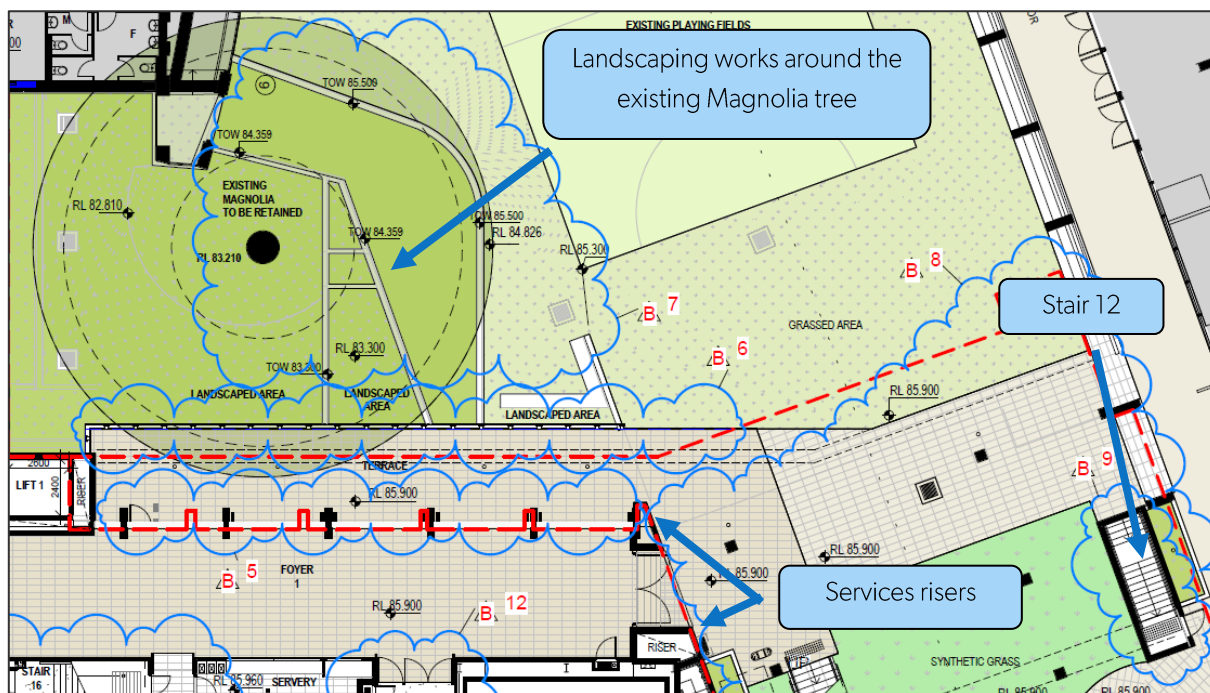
Approved floor plan level 4 (MOD 1) (Source: Applicant's Modification Application 2017)
